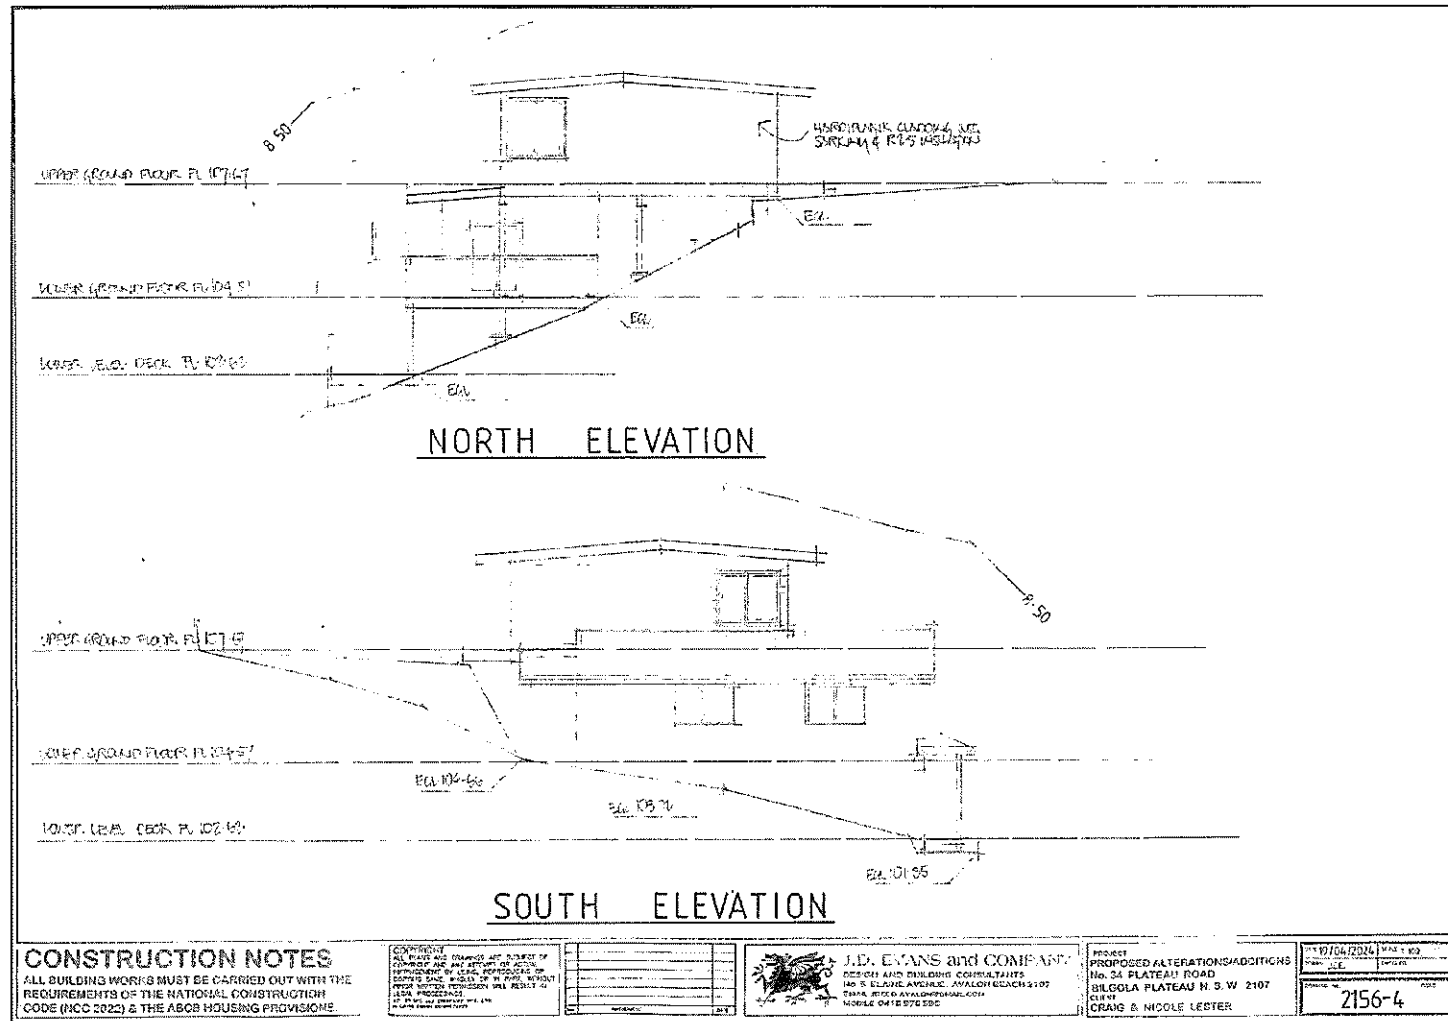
ILLUSTRATES PROPOSED NORTH & SOUTH ELEVATION
